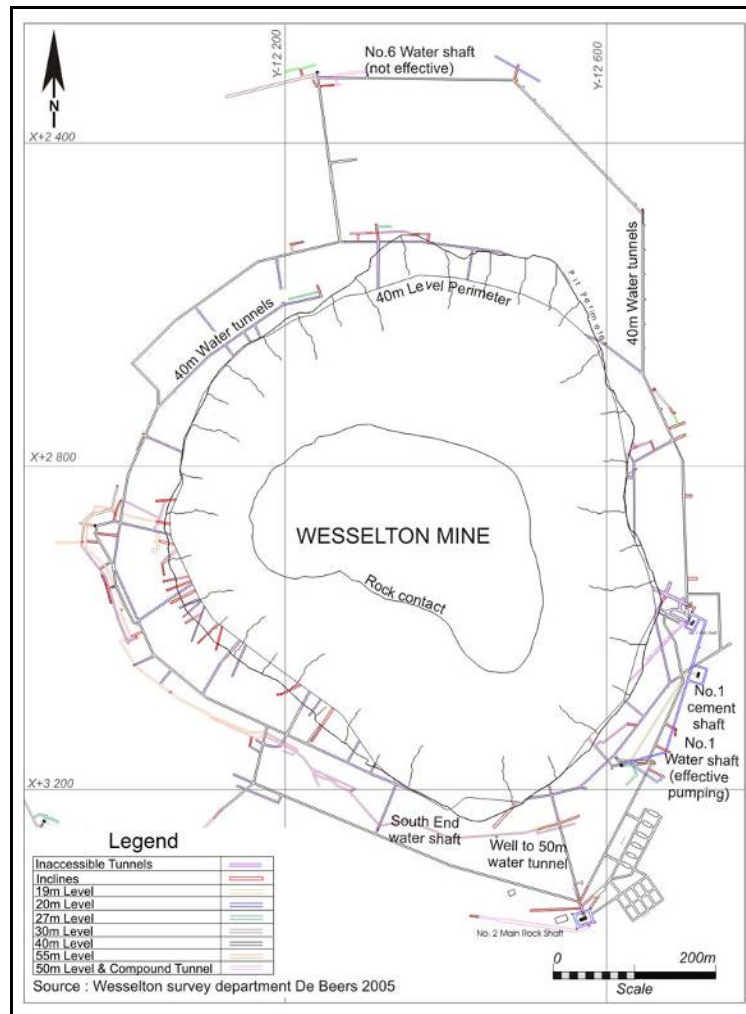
Plan view of the water tunnels that encircle Wesselton mine
